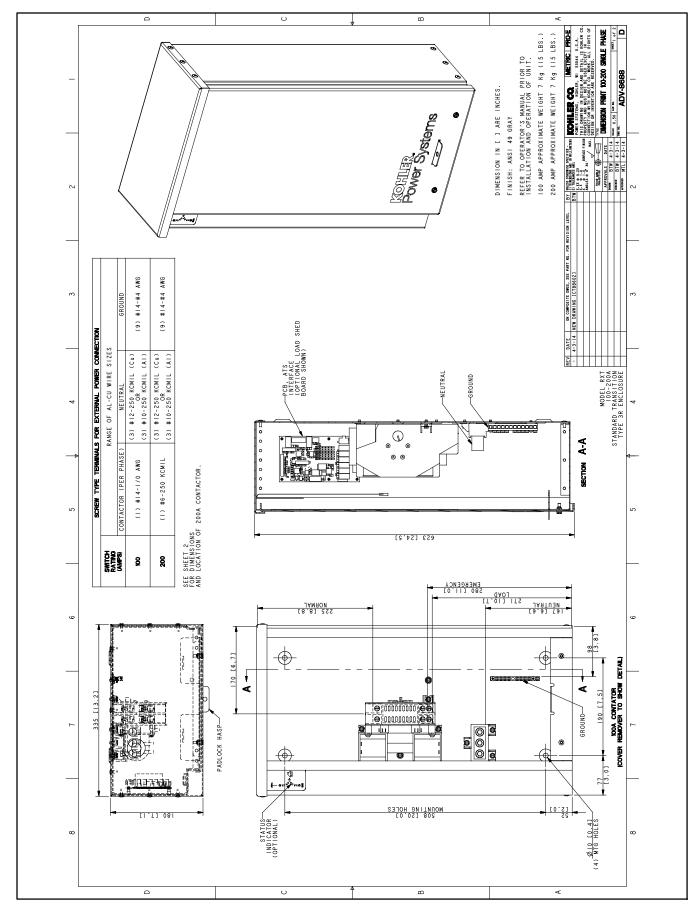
Enclosure Dimensions, 100-200 Amp Single-Phase, ADV-8688, Sheet 1 of 2
